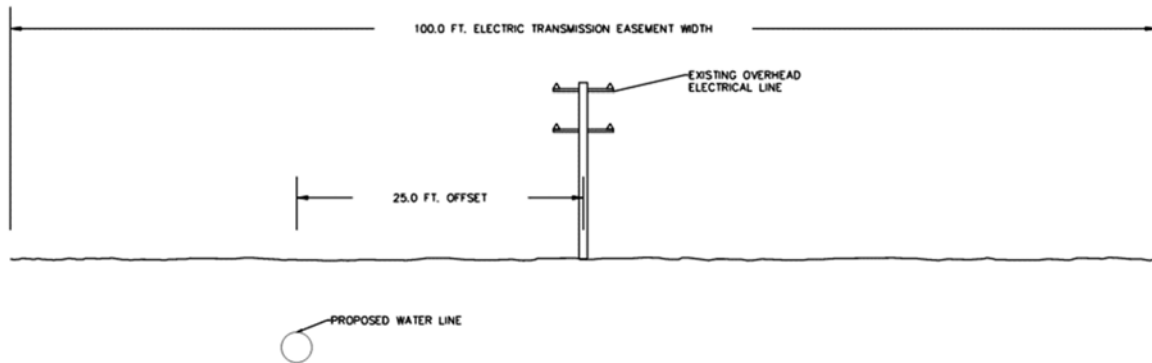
Typical Electrical Transmission Easement Section View, Facing North
